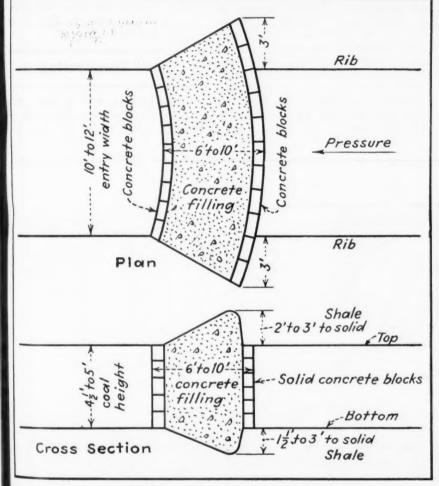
Plan and vertical cross-section of bulkhead to seal worked-out panels. It is arched against possible water pressure.
